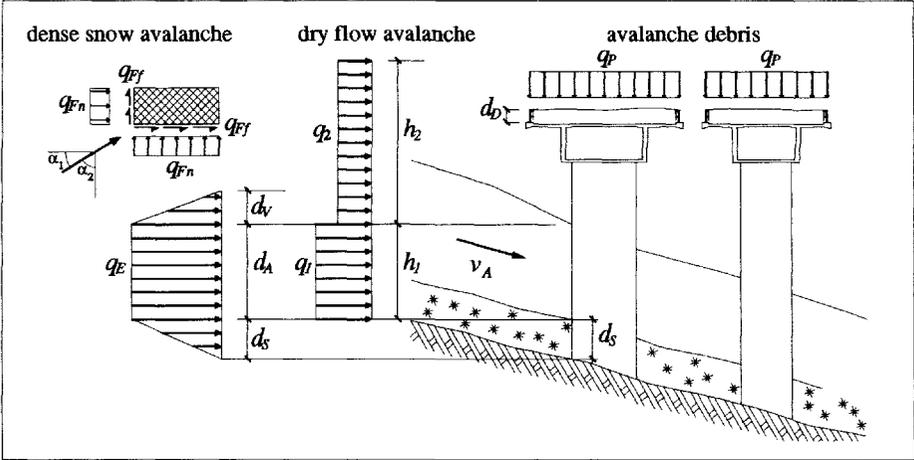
Actions on piers and girders of the Reuss bridges A2 Wattingen, normal and accidental event
